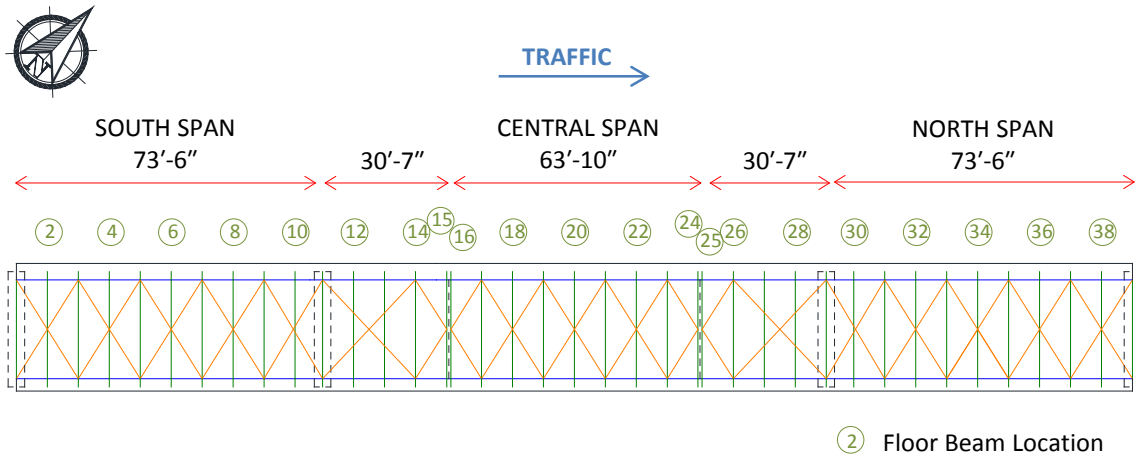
Dimensioned plan view of the Medina River Bridge showing the floor beam numbering system.
